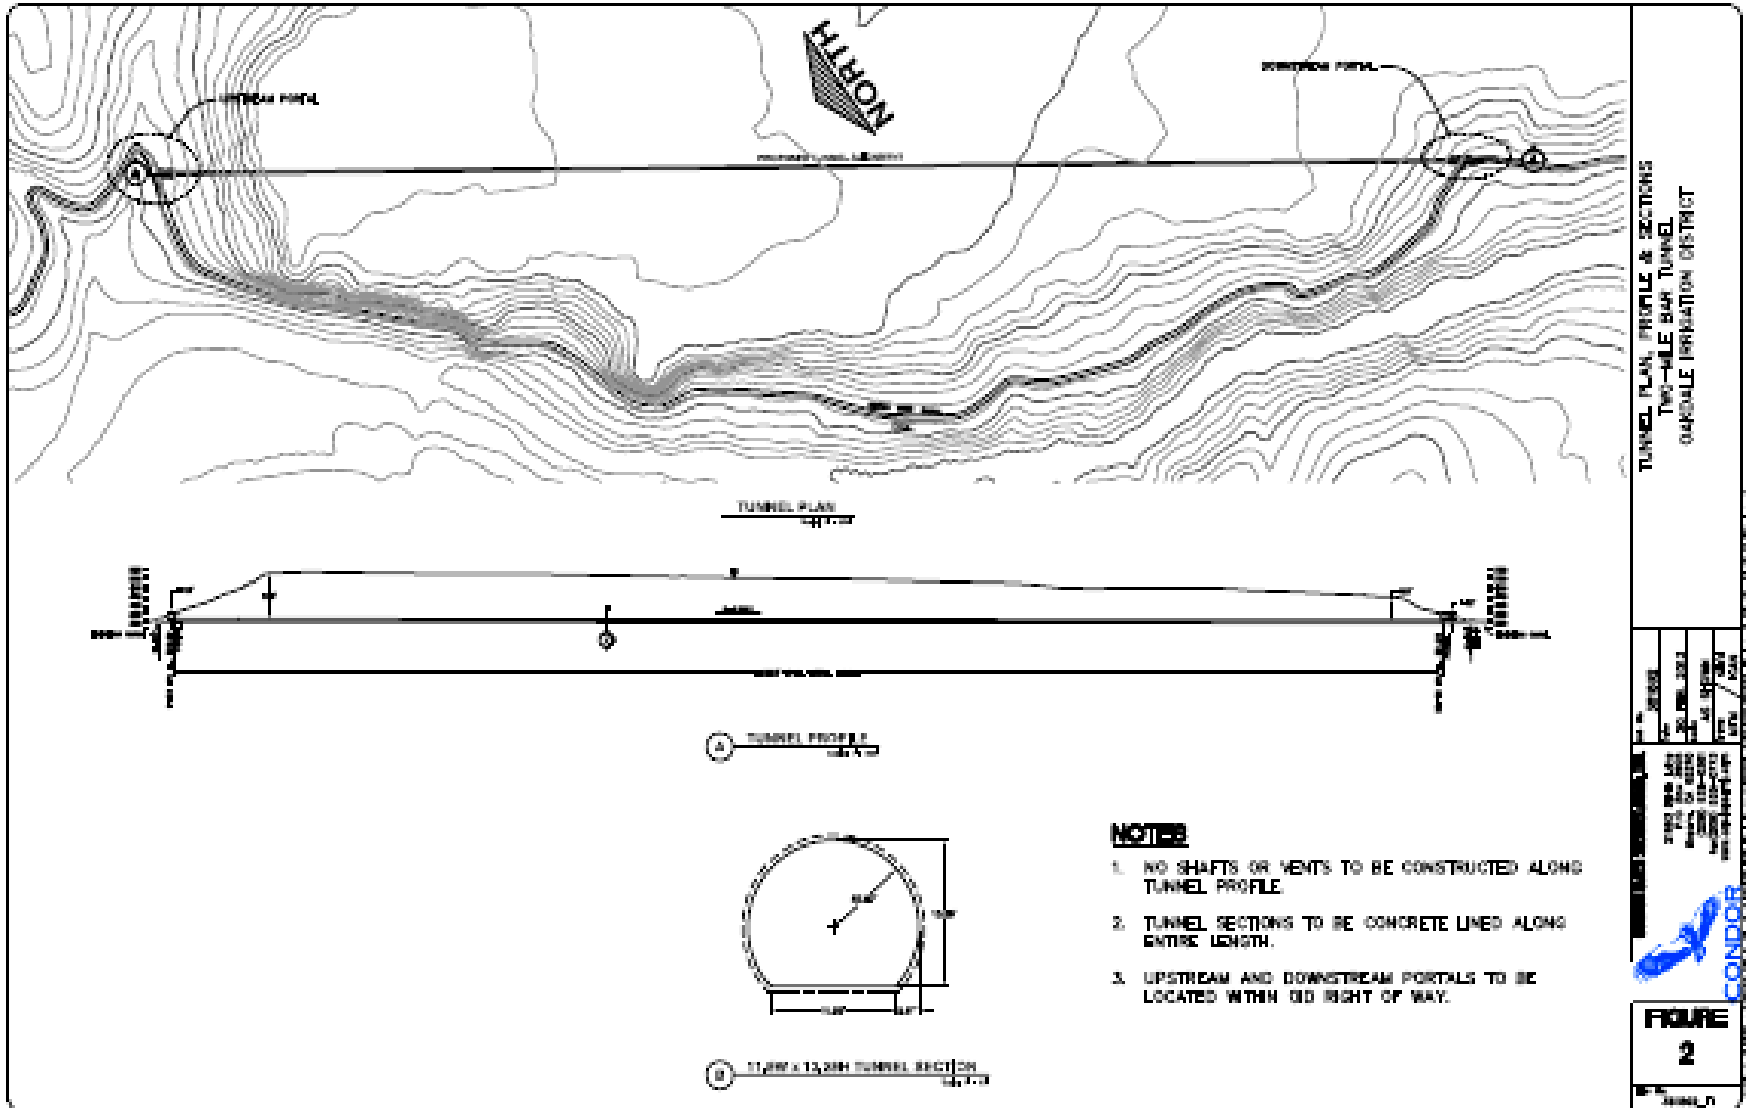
Two-Mile Bar Tunnel Plan, Profile, and Cross-section.
